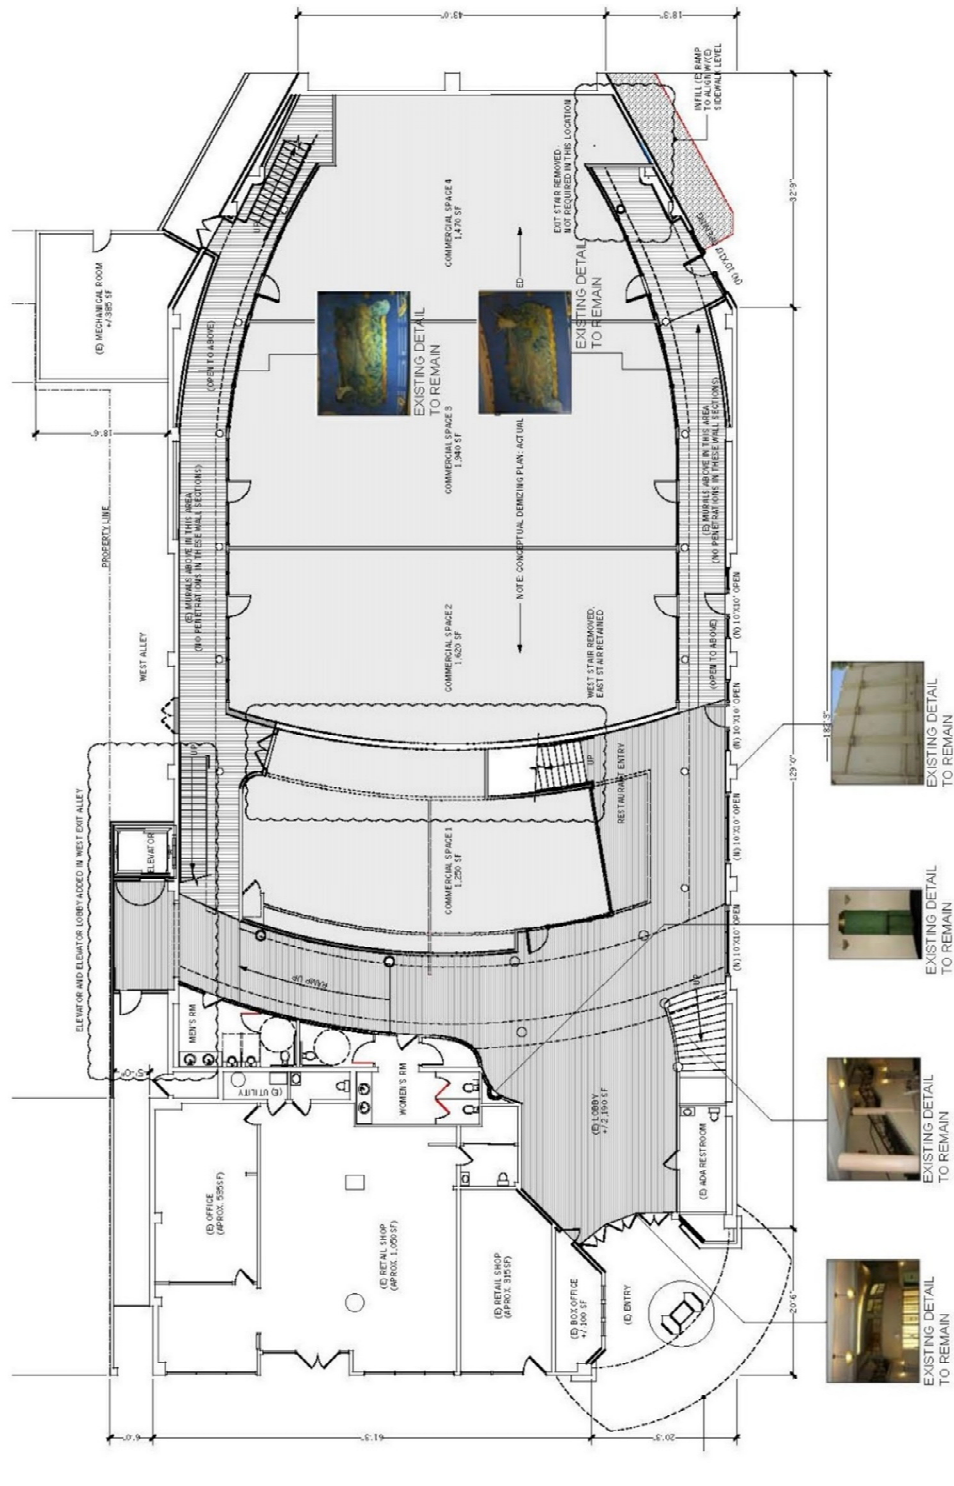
Modified Project Site Plan (Theater and Existing Residential Building)
